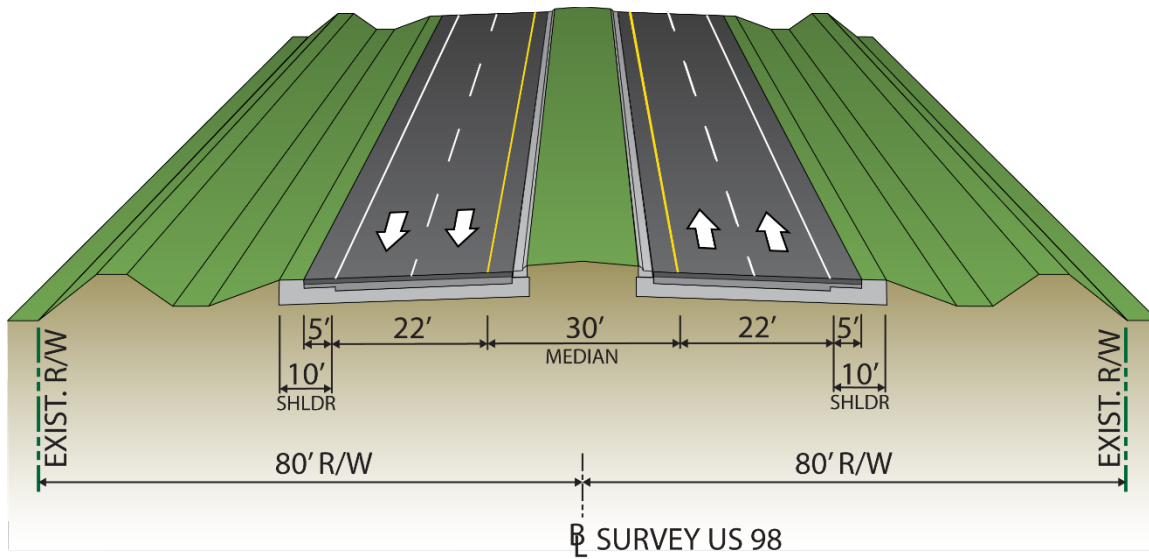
Proposed US 98 C2 (Rural) Typical Section
